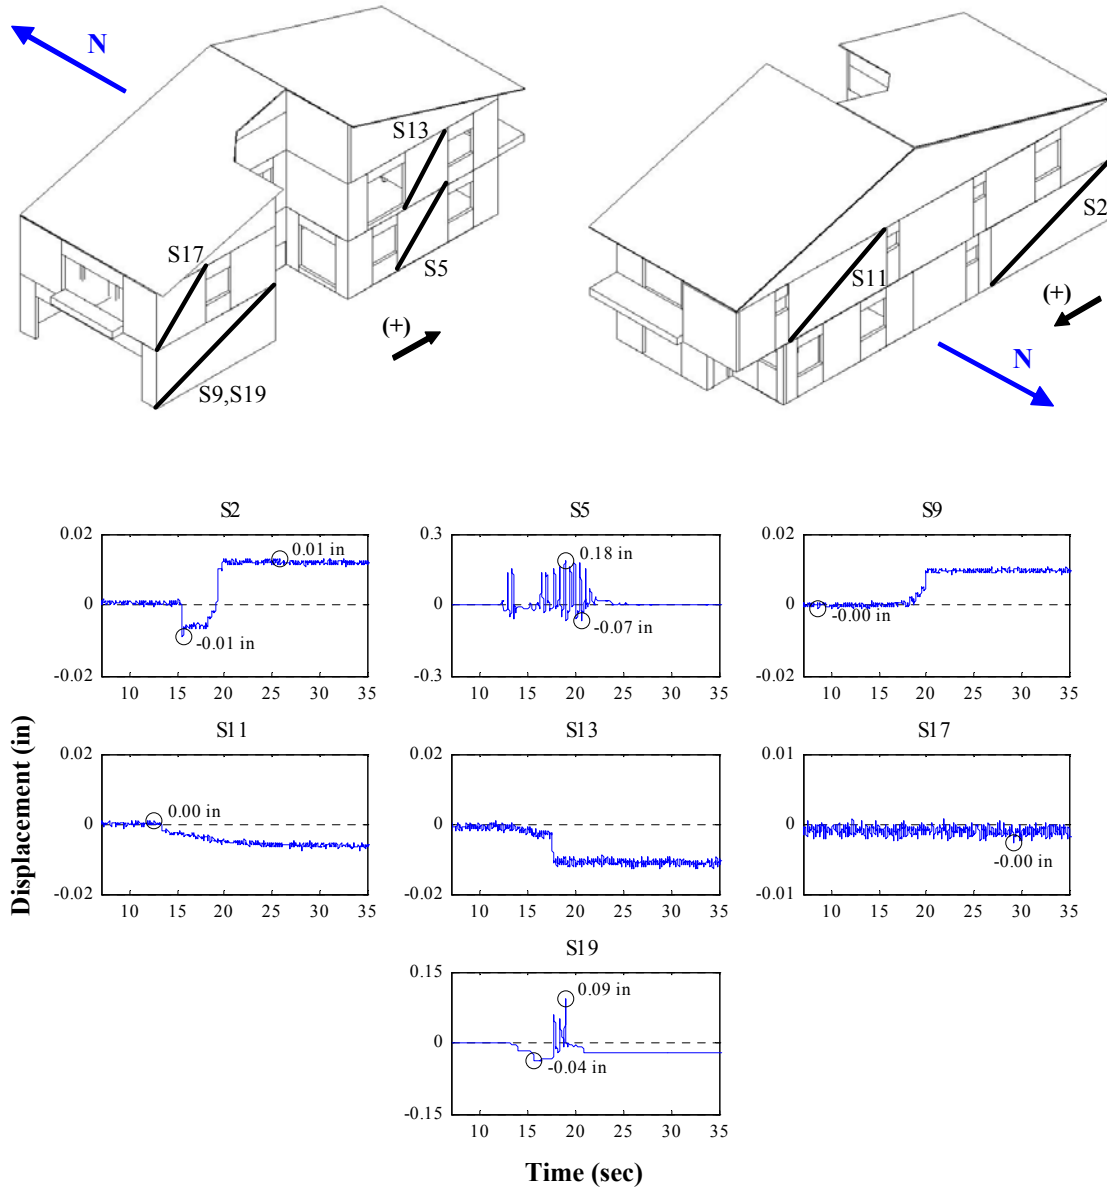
Wall deformations of east-west external walls for Test NWP5S05
